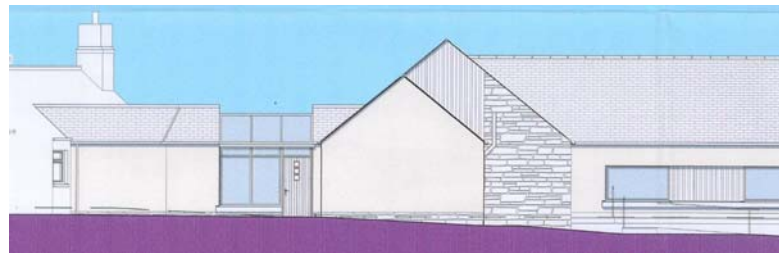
Eastern elevation, including link corridor between existing house and proposed new structure.
